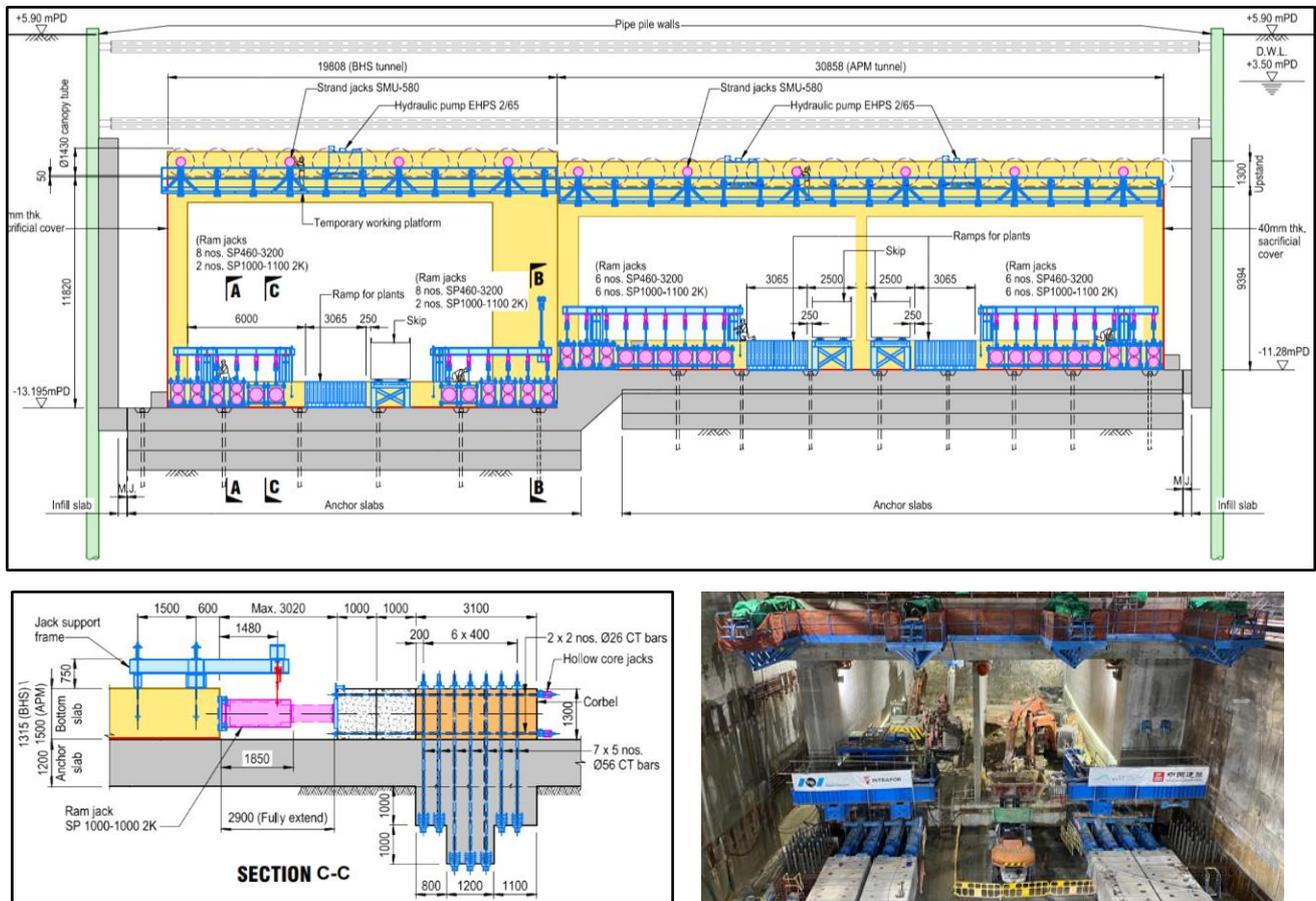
Typical Arrangement of push jacks at rear of APM and BHS box
